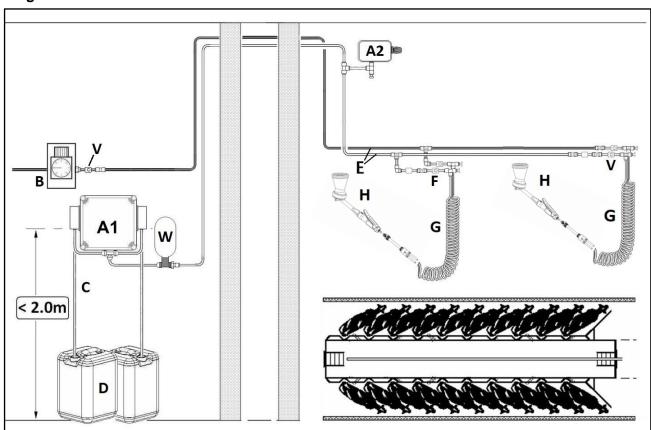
B – TWIN PUMP EASIFOAMER INSTALLATION – TYPICAL INSTALLATION LAYOUT
